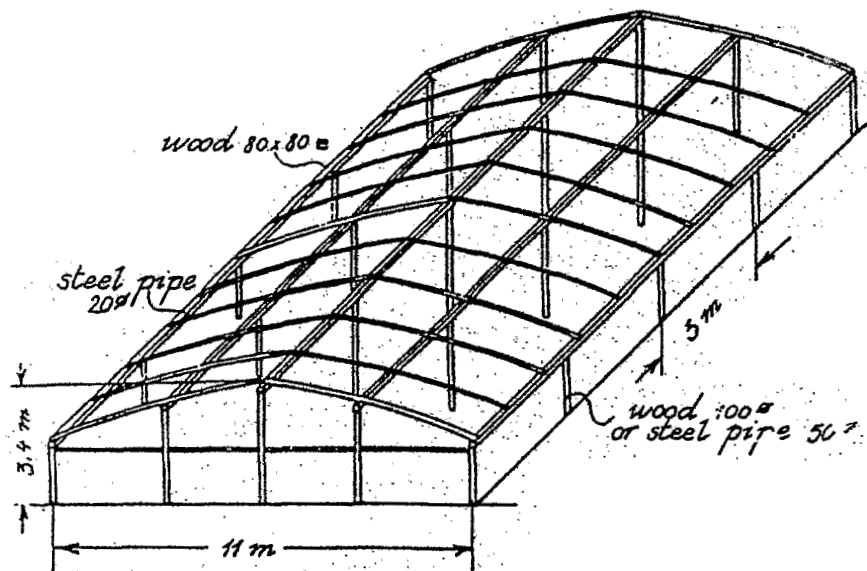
A saddle roof greenhouse type made from wood and steel pipes in Crete (FAO book).
